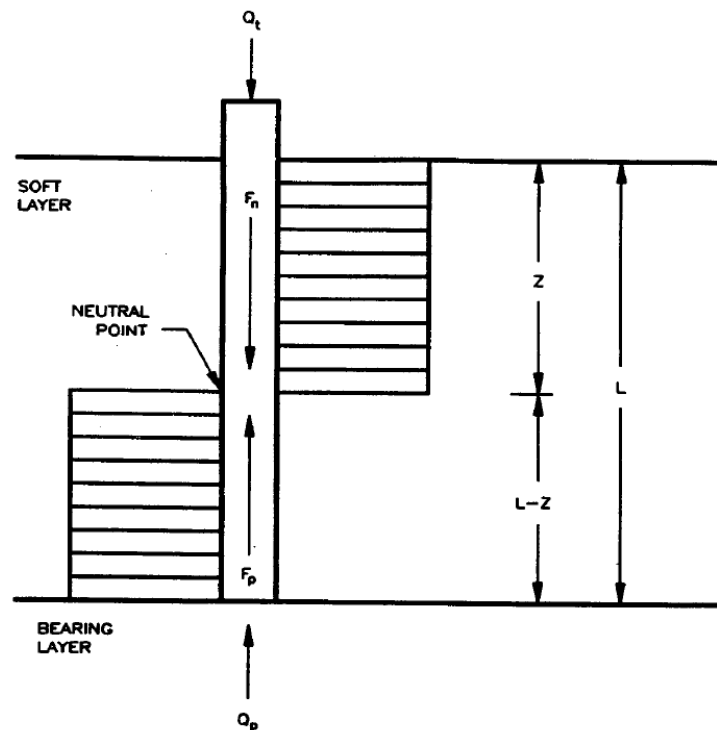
Static equilibrium for a pile subjected to structural and downdrag (Briaud and Tucker, 1997).
